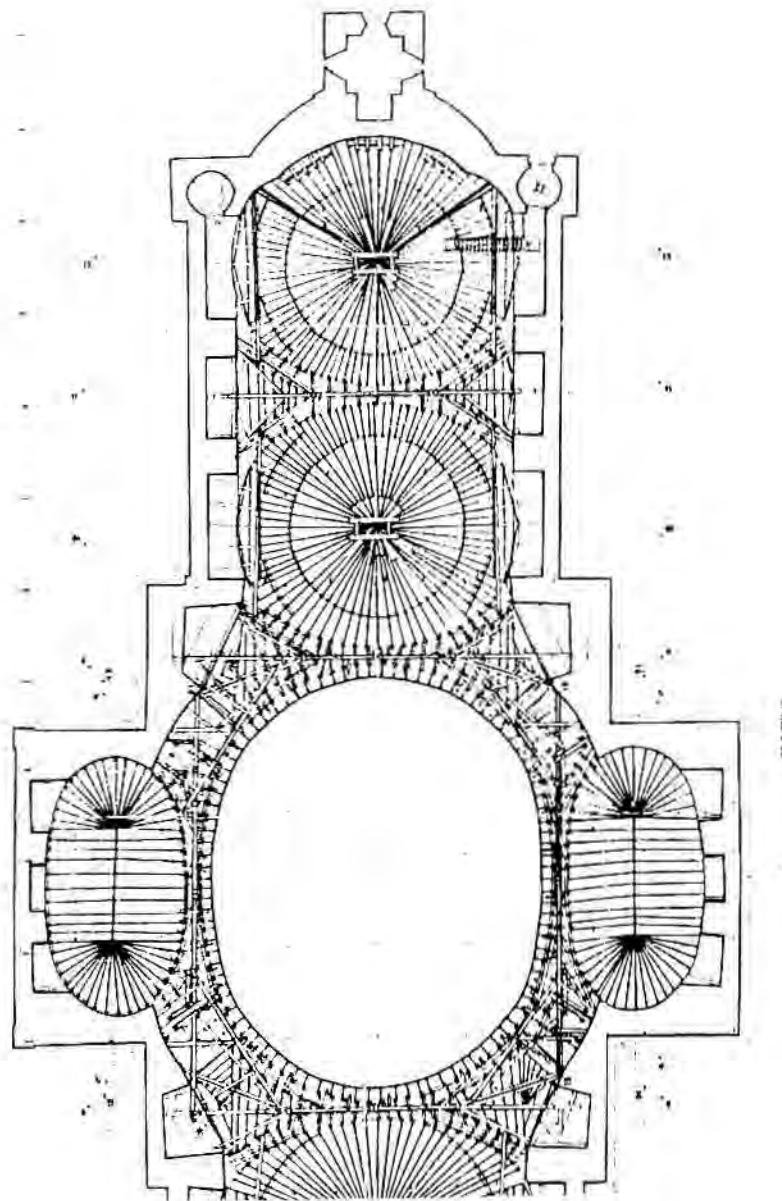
Neresheim, ceiling framing plan--arms and spherical choir vaults. Ceiling framework by Franz Joseph Pfeifer, executed 1763-70.
